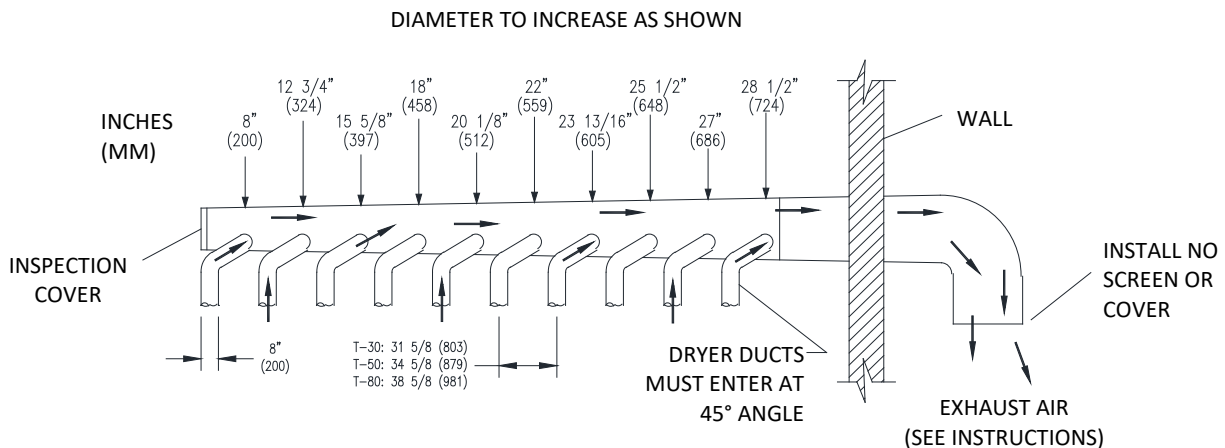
Dryer Exhausting Using A Main Discharge Duct
